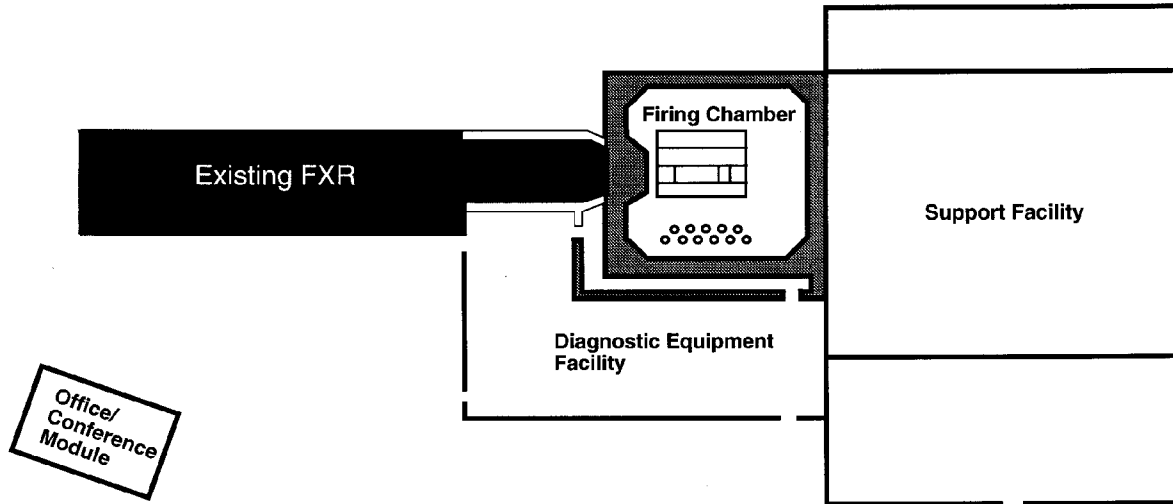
Plan view of the proposed Contained Firing Facility additions to Bunker 801.
